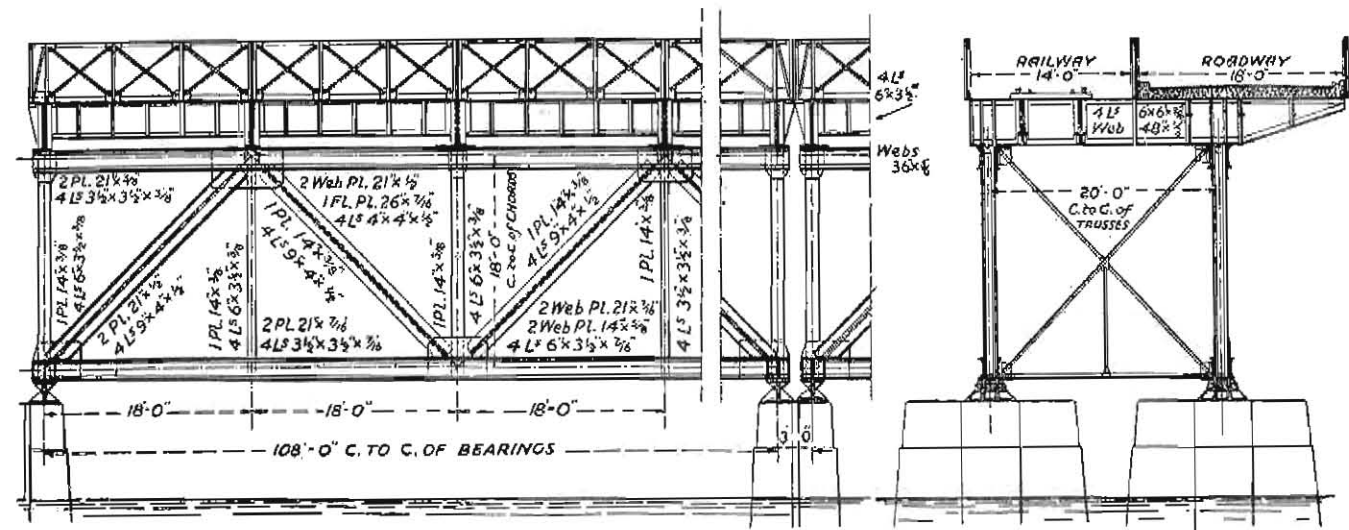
ELEVATION AND SECTION OF A TYPICAL SPAN
